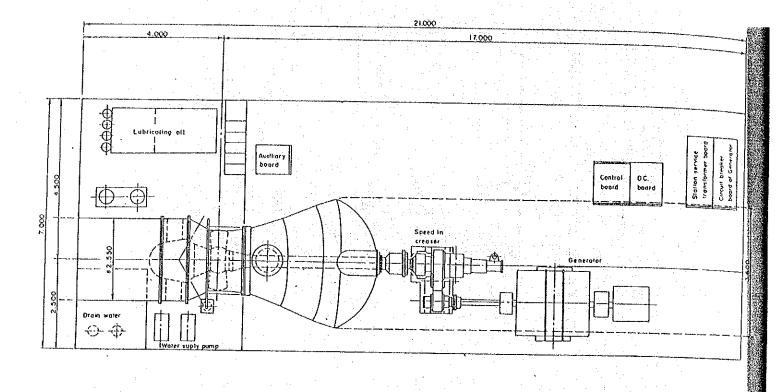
UPPER MAE WONG PROJECT POWER HOUSE PLAN AND CROSS SECTION
